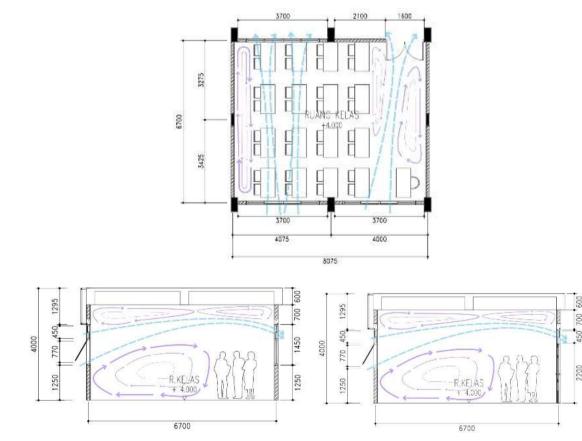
The Movement of Cross-Ventilation Wind in The Plan and Section (Source by Author, 2024)
